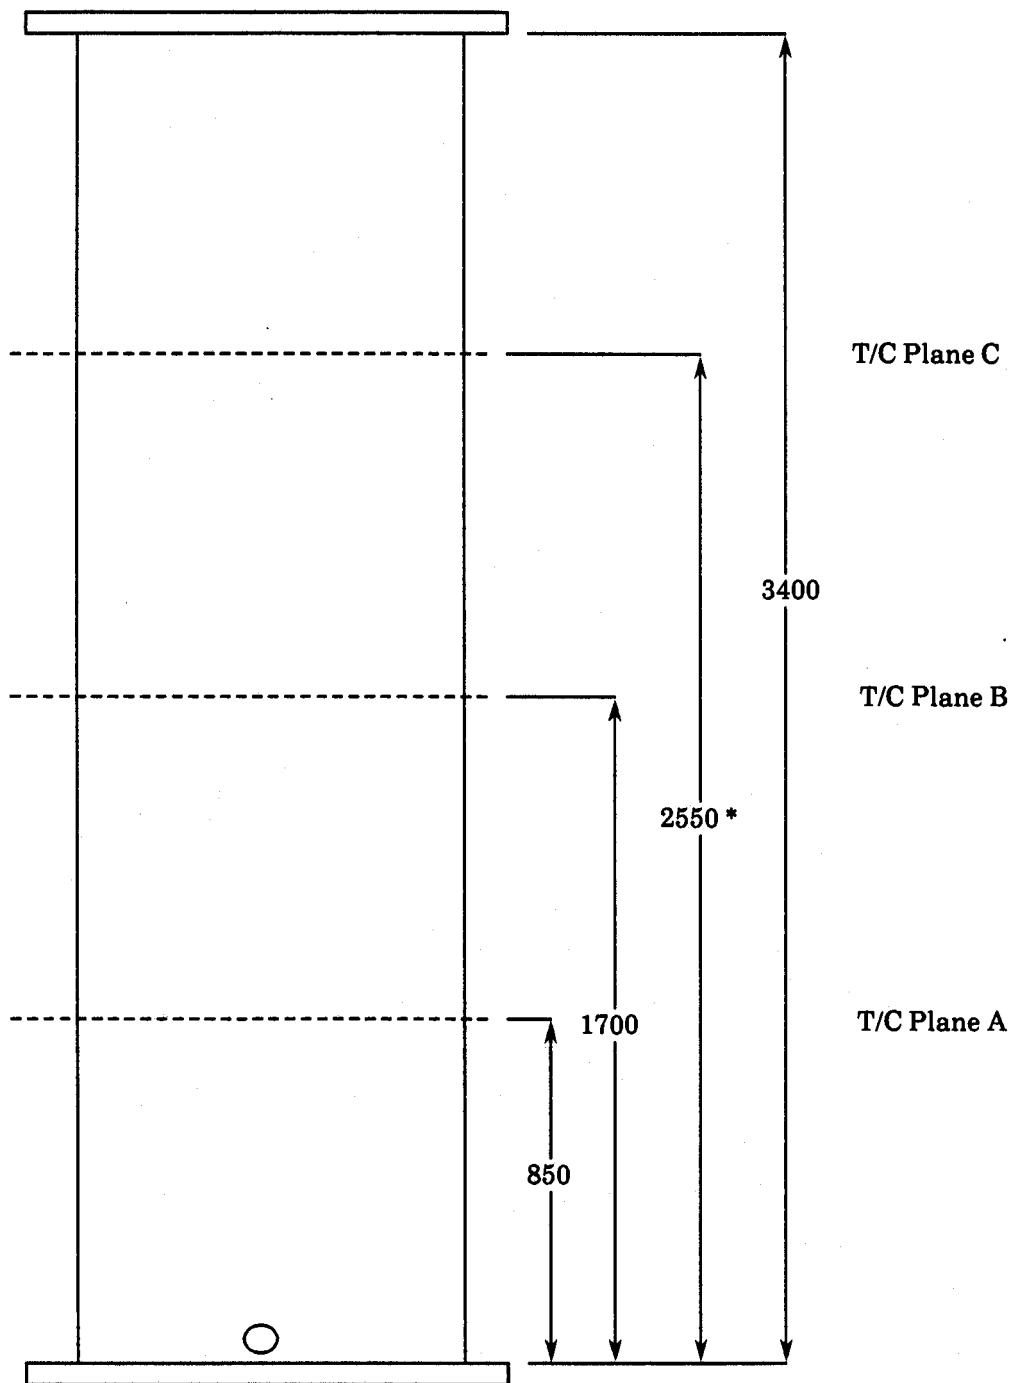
GENERAL ARRANGEMENT OF HOLLOW SECTIONS
